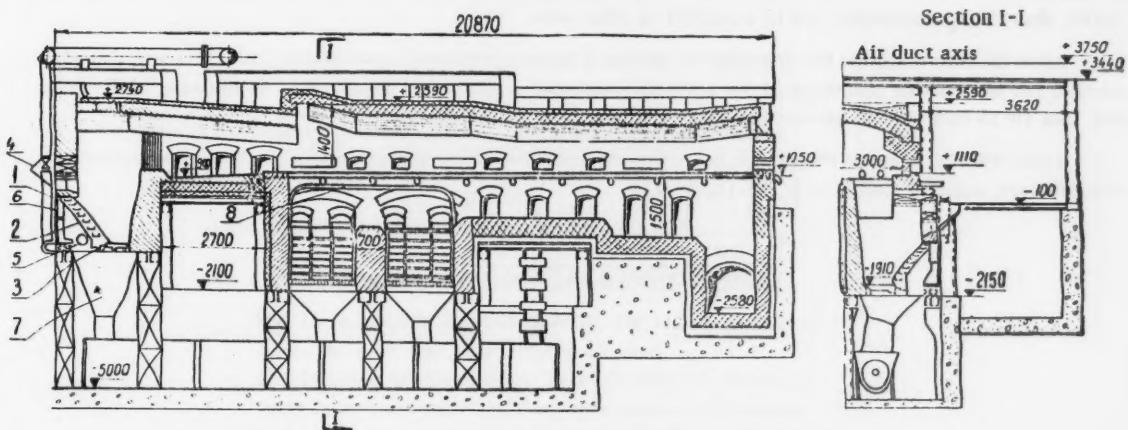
Continuous furnace for heating ingots, after reconstruction.
